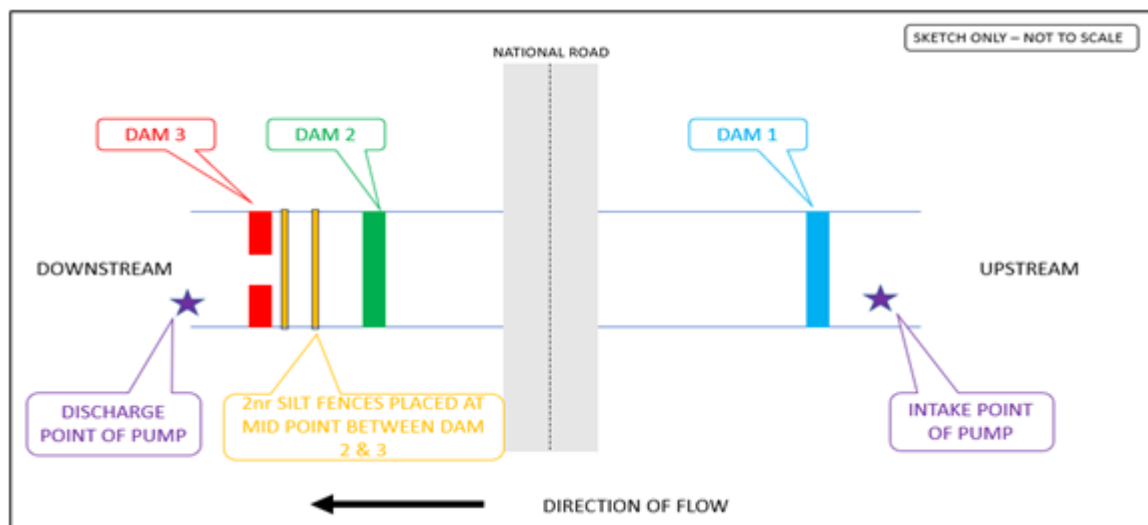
Schematic of three dam dewatering system proposed at Strade River Bridge.
